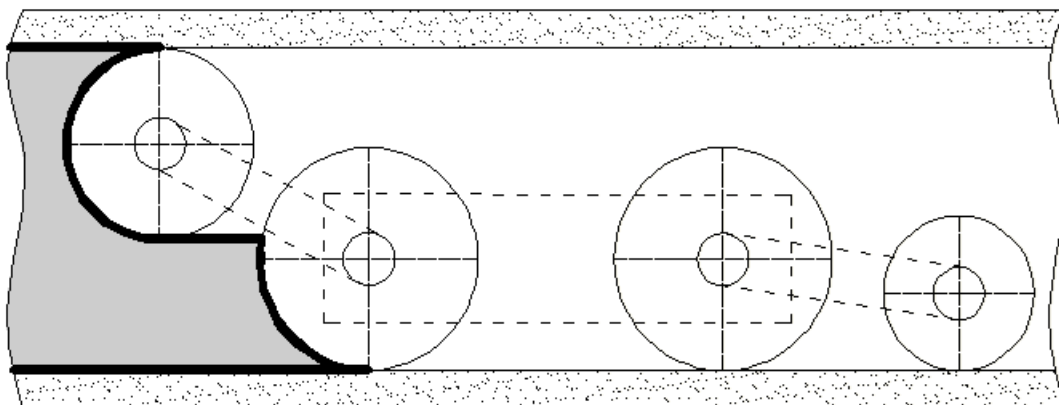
Scheme of coal seam extraction by cutter-loader equipped with four augers
